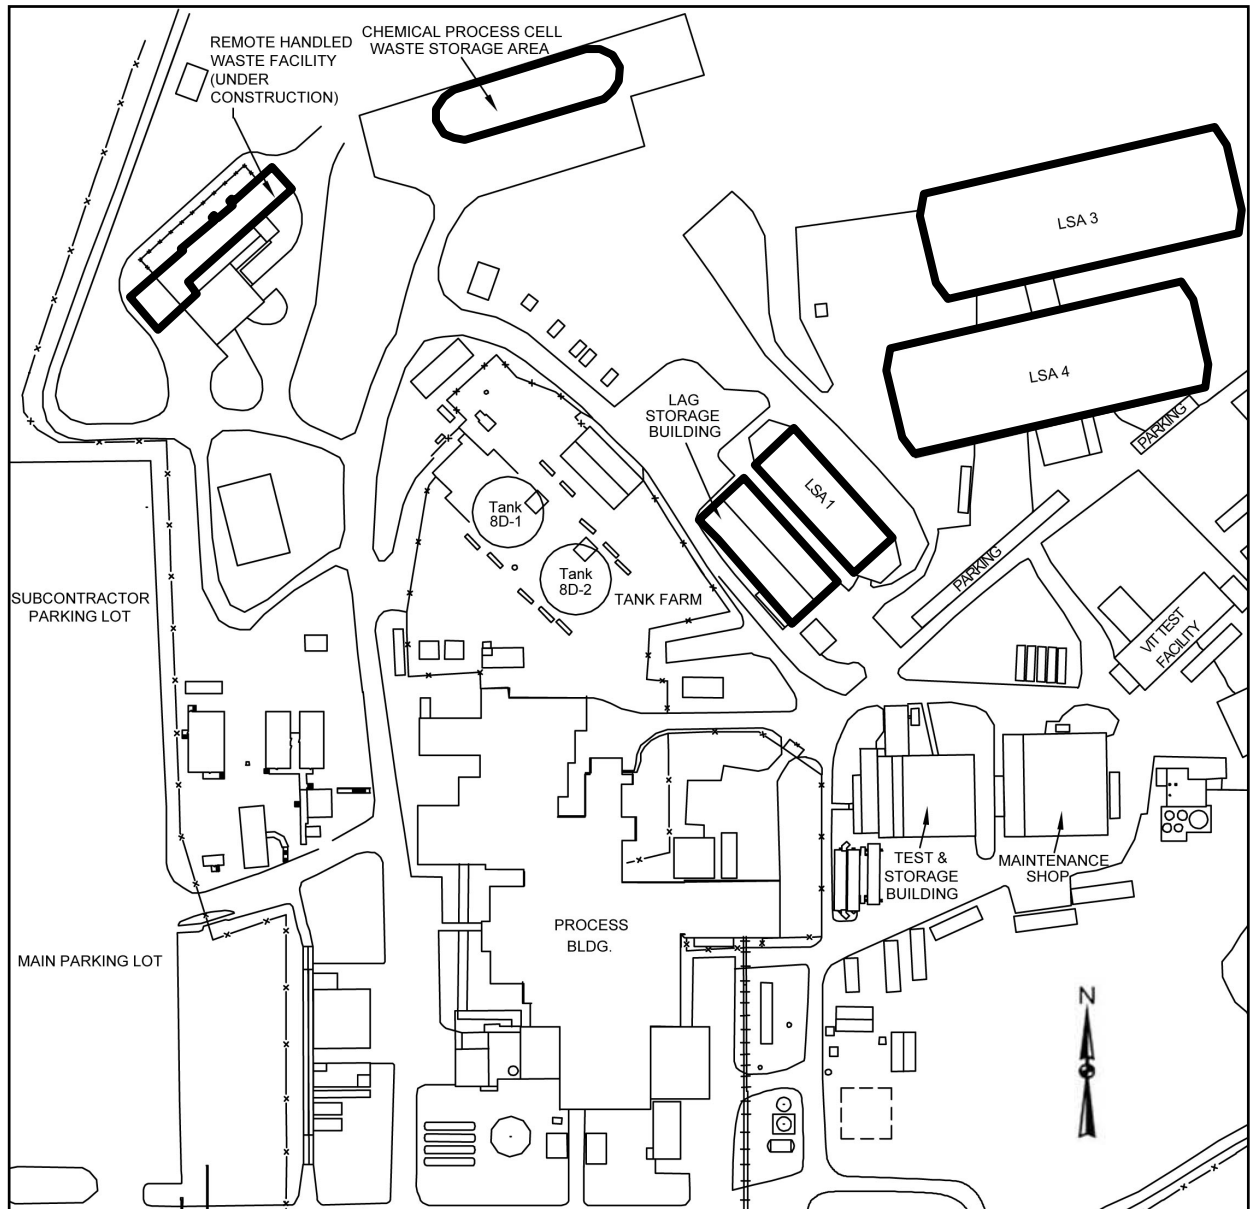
Lag Storage Building, Lag Storage Additions, Chemical Process Cell Waste Storage Area, and Remote Handled Waste Facility
